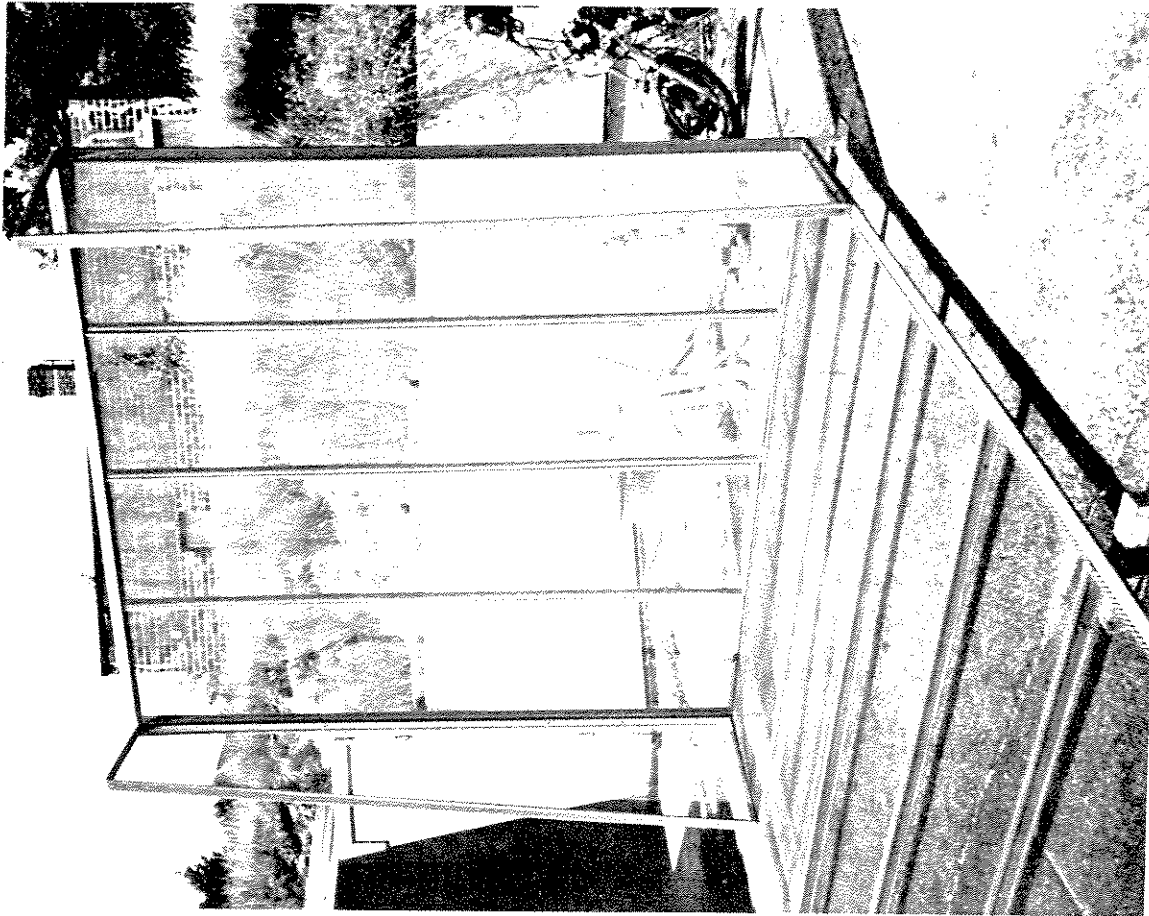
Trial assembly of first C-21. Short-side subassembly has been installed between corner panels. Note supporting blocks under bottom pan.
